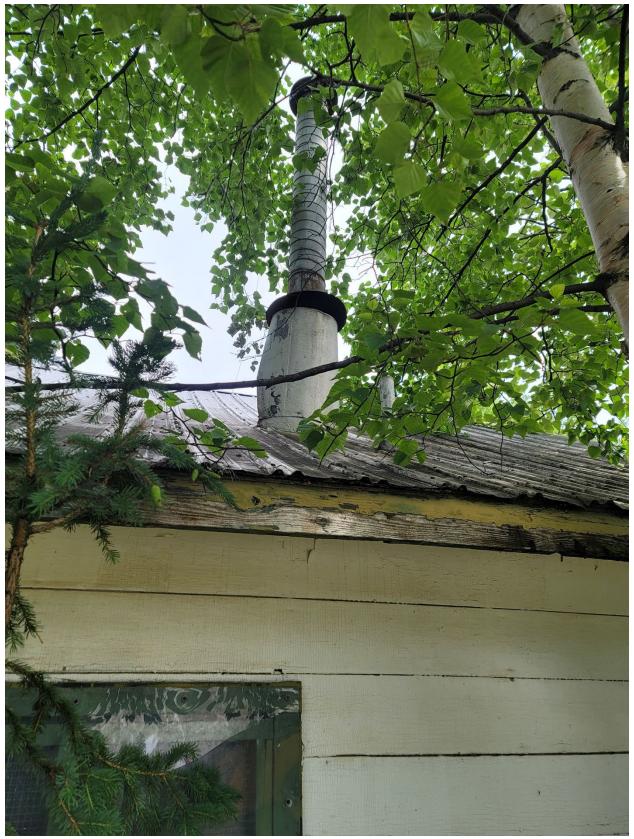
Detail photograph of the chimney on the southwest side of Building C (©TNSDS 2023).
